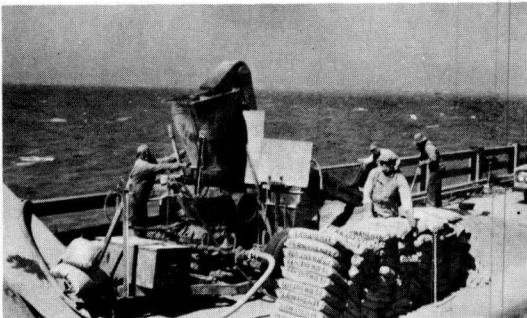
Contractor's equipment for batching, mixing, and shooting shotcrete.
